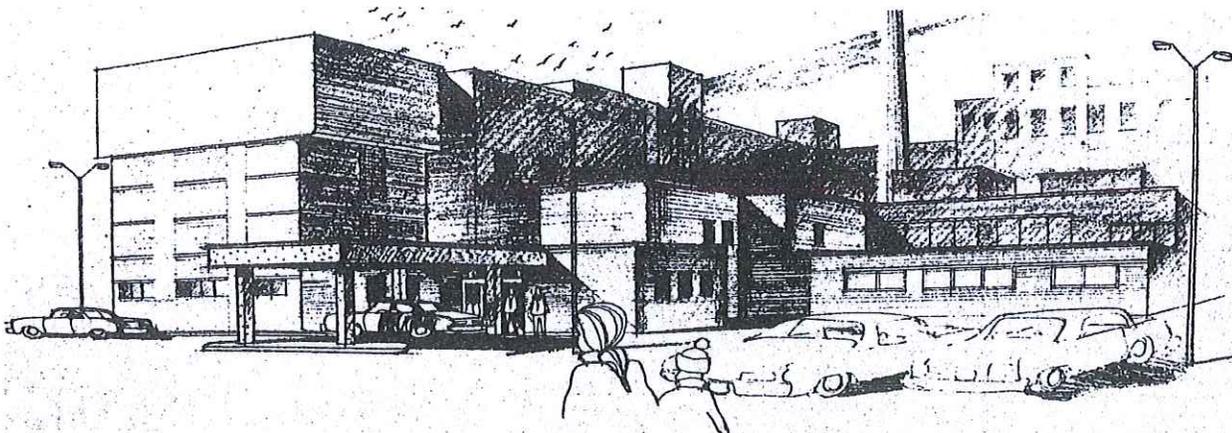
Architect's rendering of proposed hospital south expansion by Ekdahl, Davis, Depew, Persson – looking NW from south of hospital building (*Topeka State Journal*, 27 July 1977)
